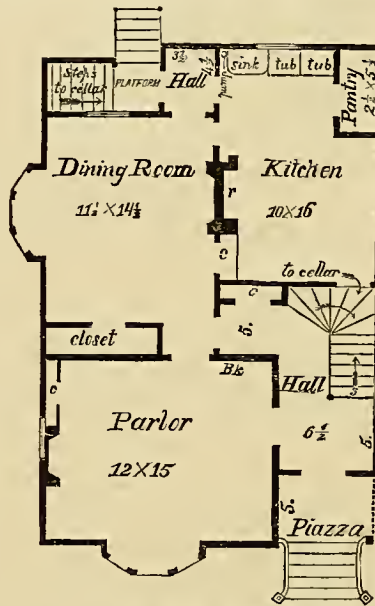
FIRST STORY.—FLOOR PLAN.
